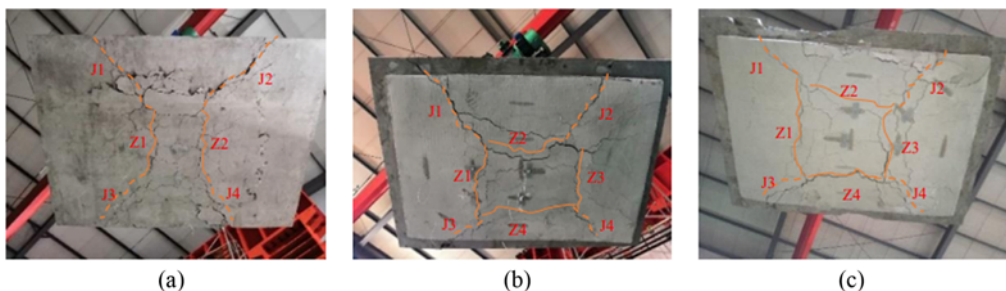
Crack Pattern at the bottom Face of Tested Specimens: (a) B1, (b) B2, (c) B3
